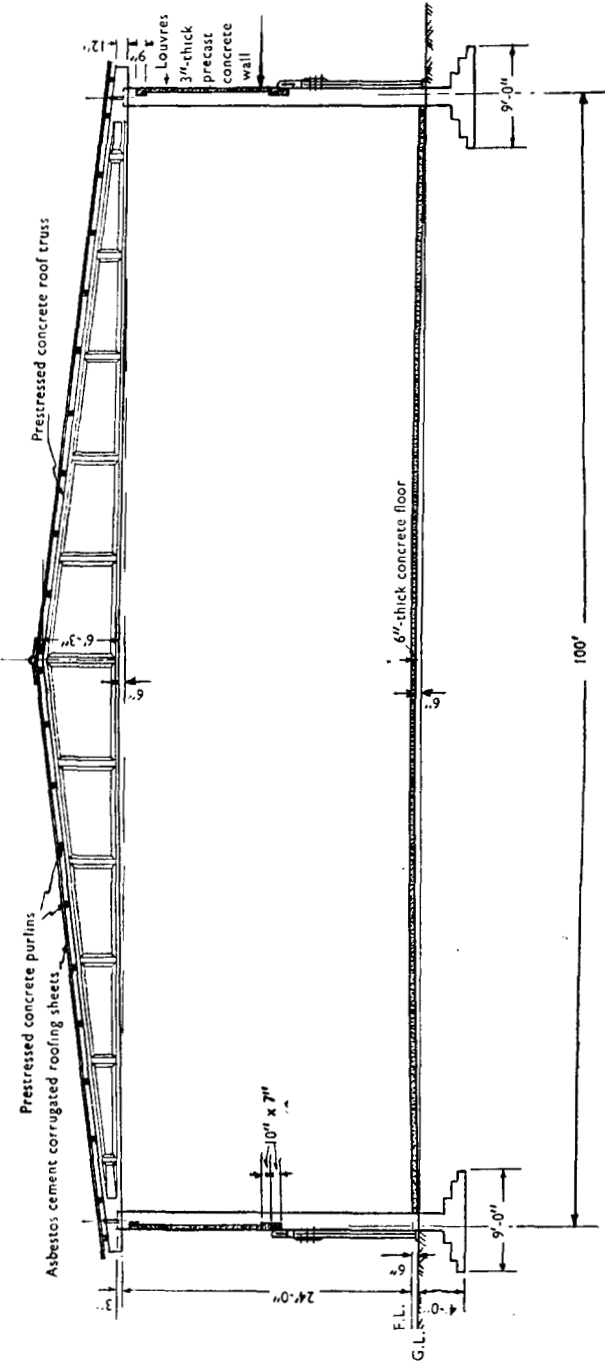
CROSS SECTION OF WAREHOUSE AT CANAL YARD
